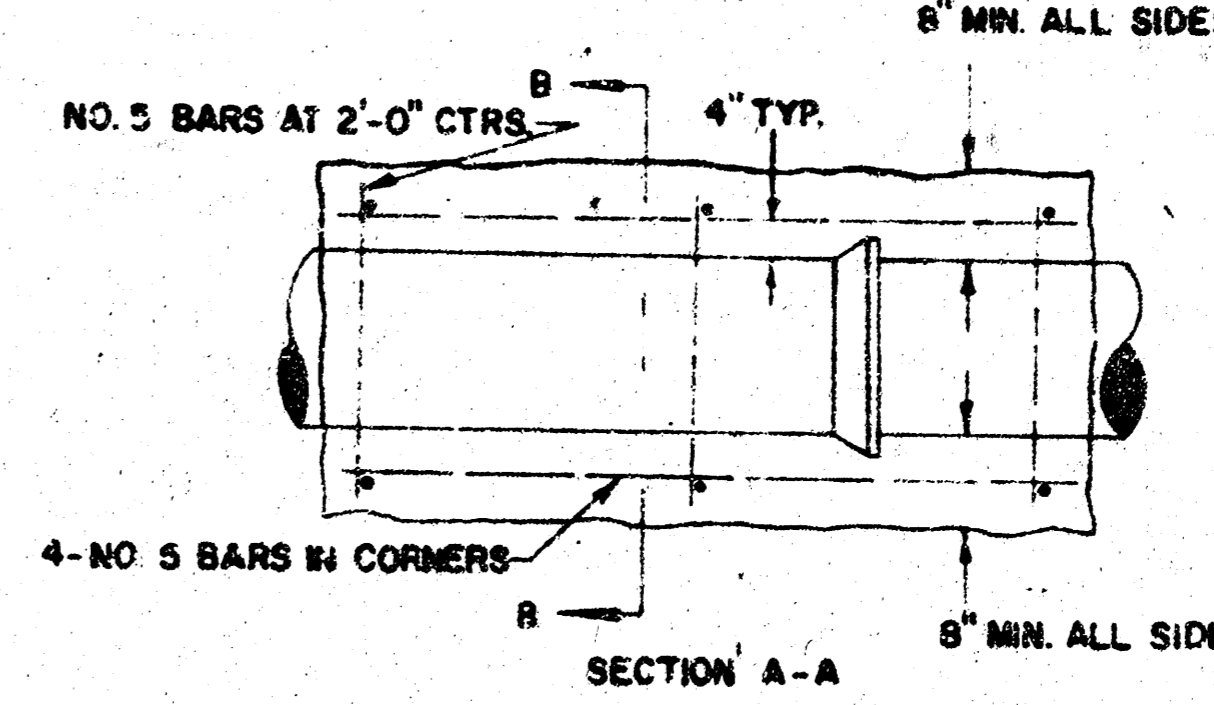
DETAIL OF DROP STACK FOR EXISTING MANHOLES IN GROUND WATER
